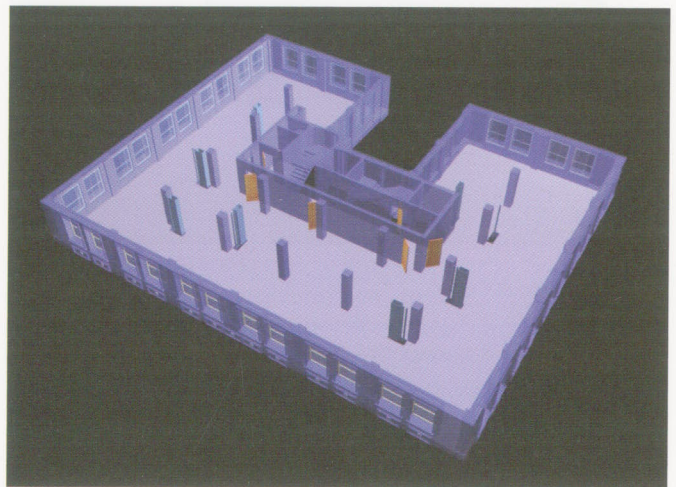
is a typical floor of the building. Its structure and envelope—protected by historic guidelines—and the building’s elevators, fire stairs, central MEP shaft, and public corridors, are in blue. They have not changed. The “final” positions of the new vertical MEP shafts (shown in pink) are indicated. We decided to retain as much of the existing building as possible. The existing vertical circulation, main MEP shafts, and public corridors are retained.
